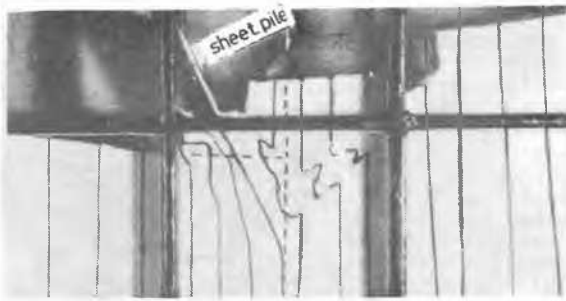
Failure of a cantilever sheet piling (after test).
